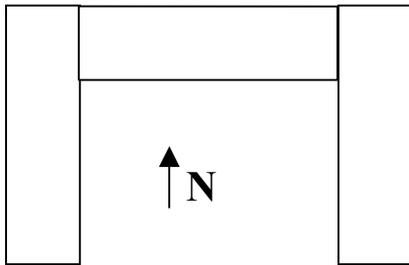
Motel 41: Plan view to left showing location of demolished wall.
